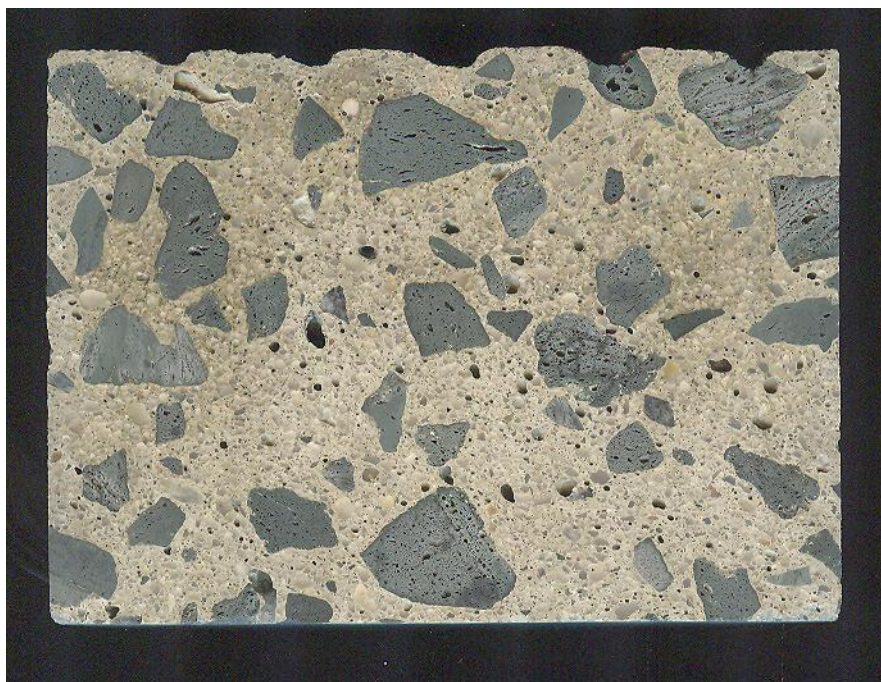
Scanned image of polished surface prepared from bridge deck 8L, core C-8. Bridge deck surface is at top.
